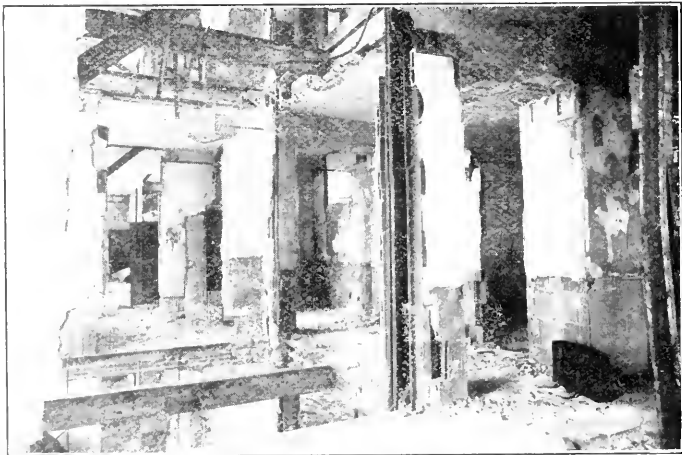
DAMAGE TO ELEVATOR FRAMING
